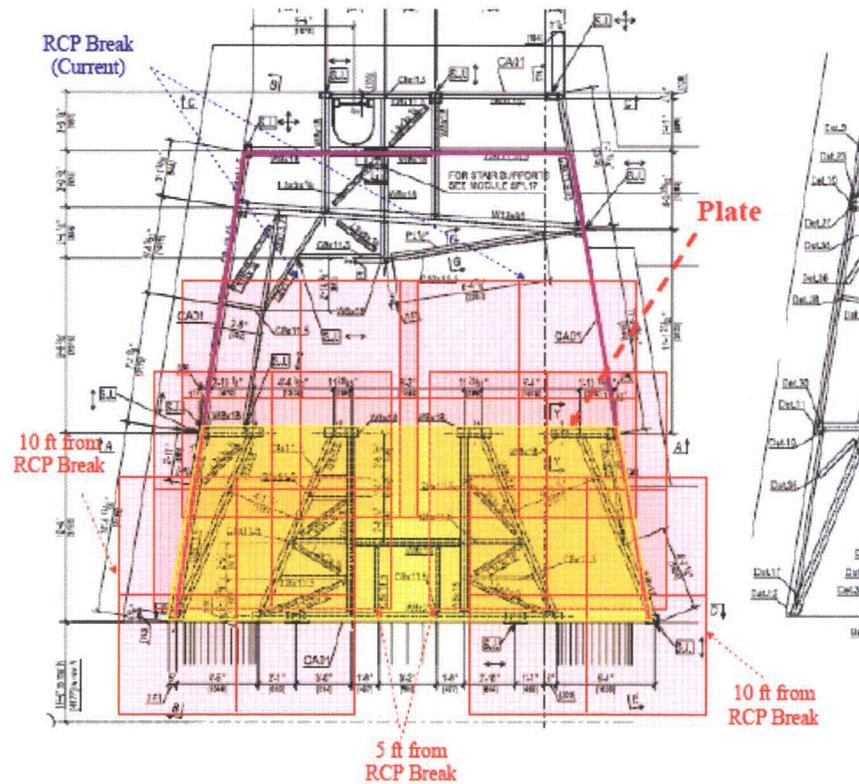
CL Breaks At RCP and 5' / 10' Plan View (over 104' 5.5" elevation platform beams)
